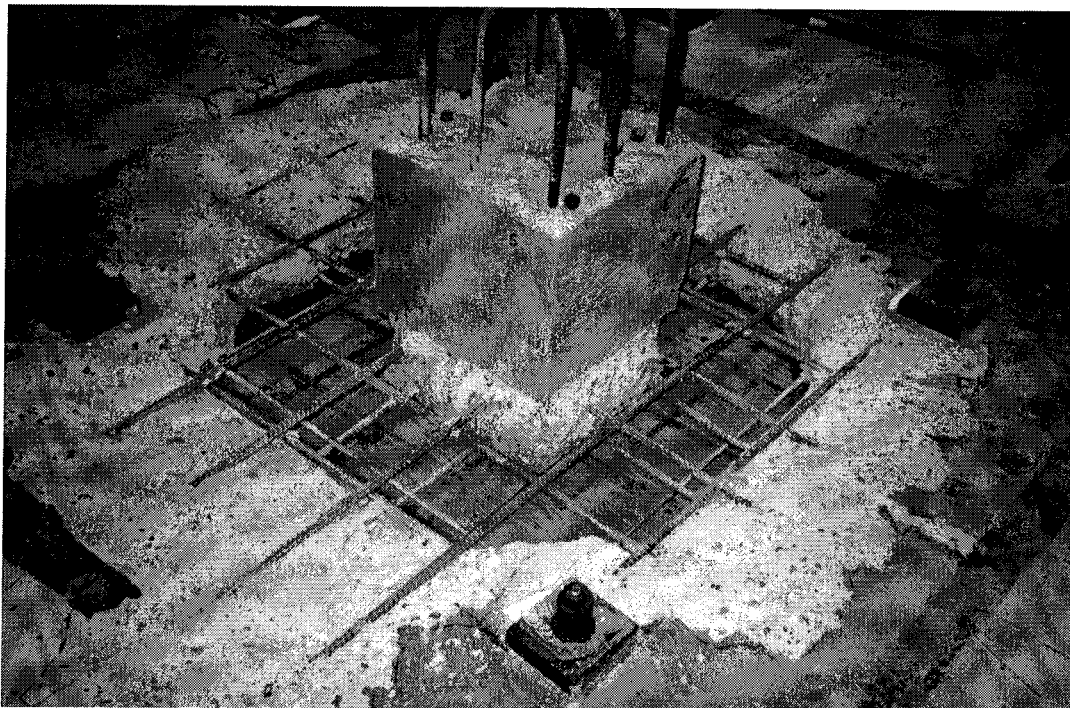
Test ER3-CS2 : Strengthening Layout
